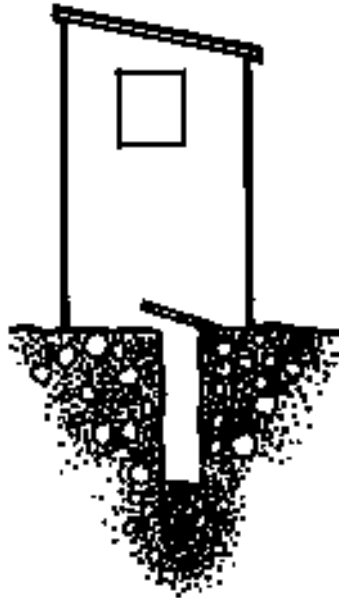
Dry drop-hole toilet with properly constructed walls and roof but without a seat.
